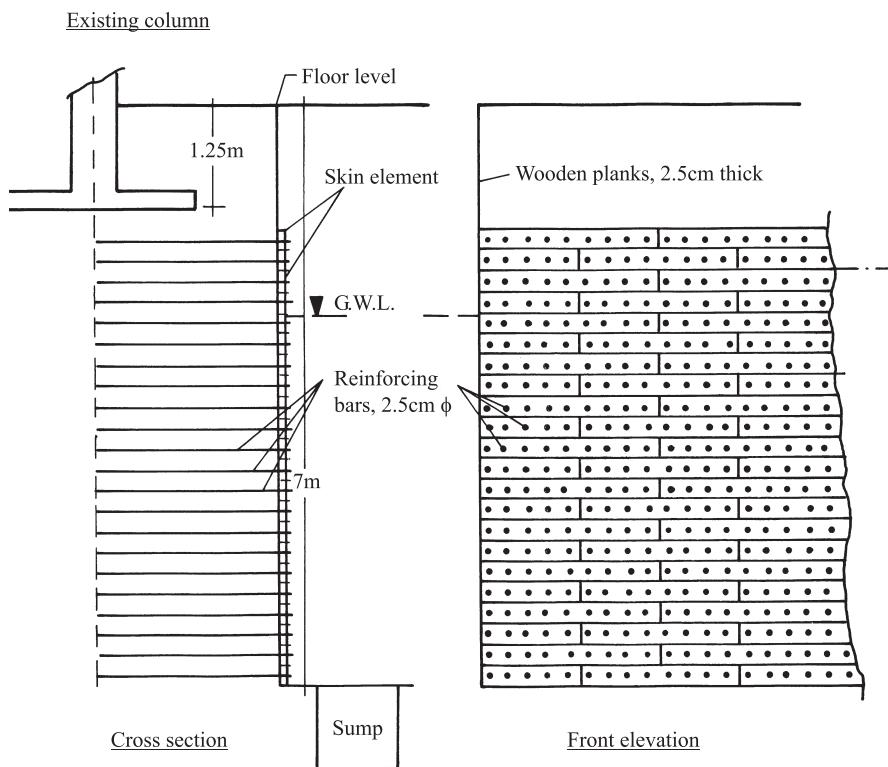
Deep excavation adjoining a load-bearing wall in an industrial building (Nagaraj et al. 1982).
